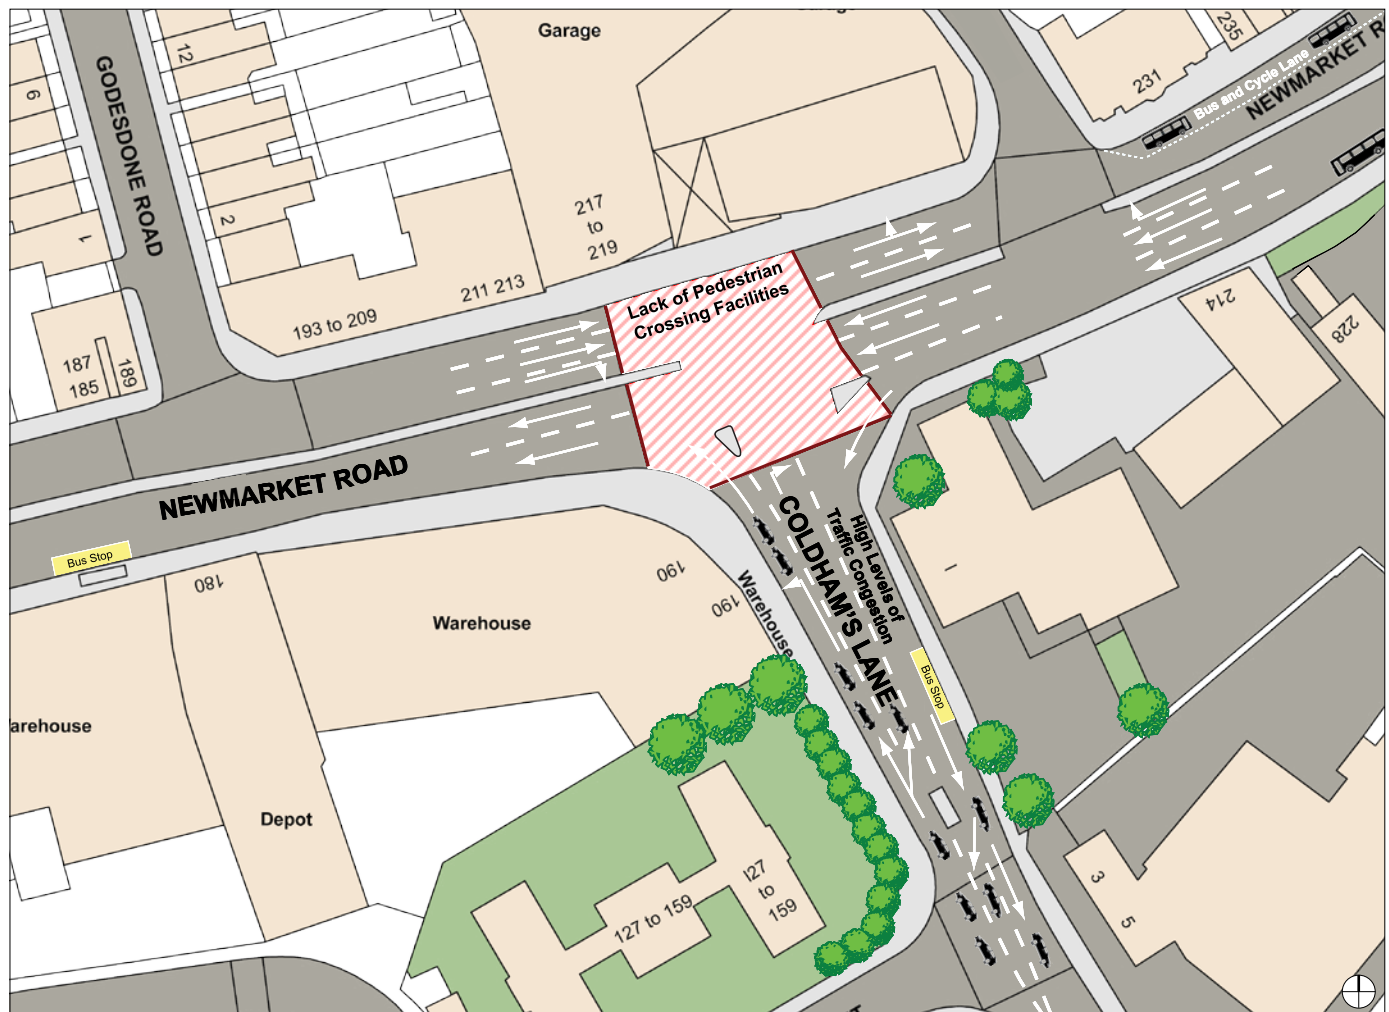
Existing arrangement at Coldham's Lane/Newmarket Road junction
